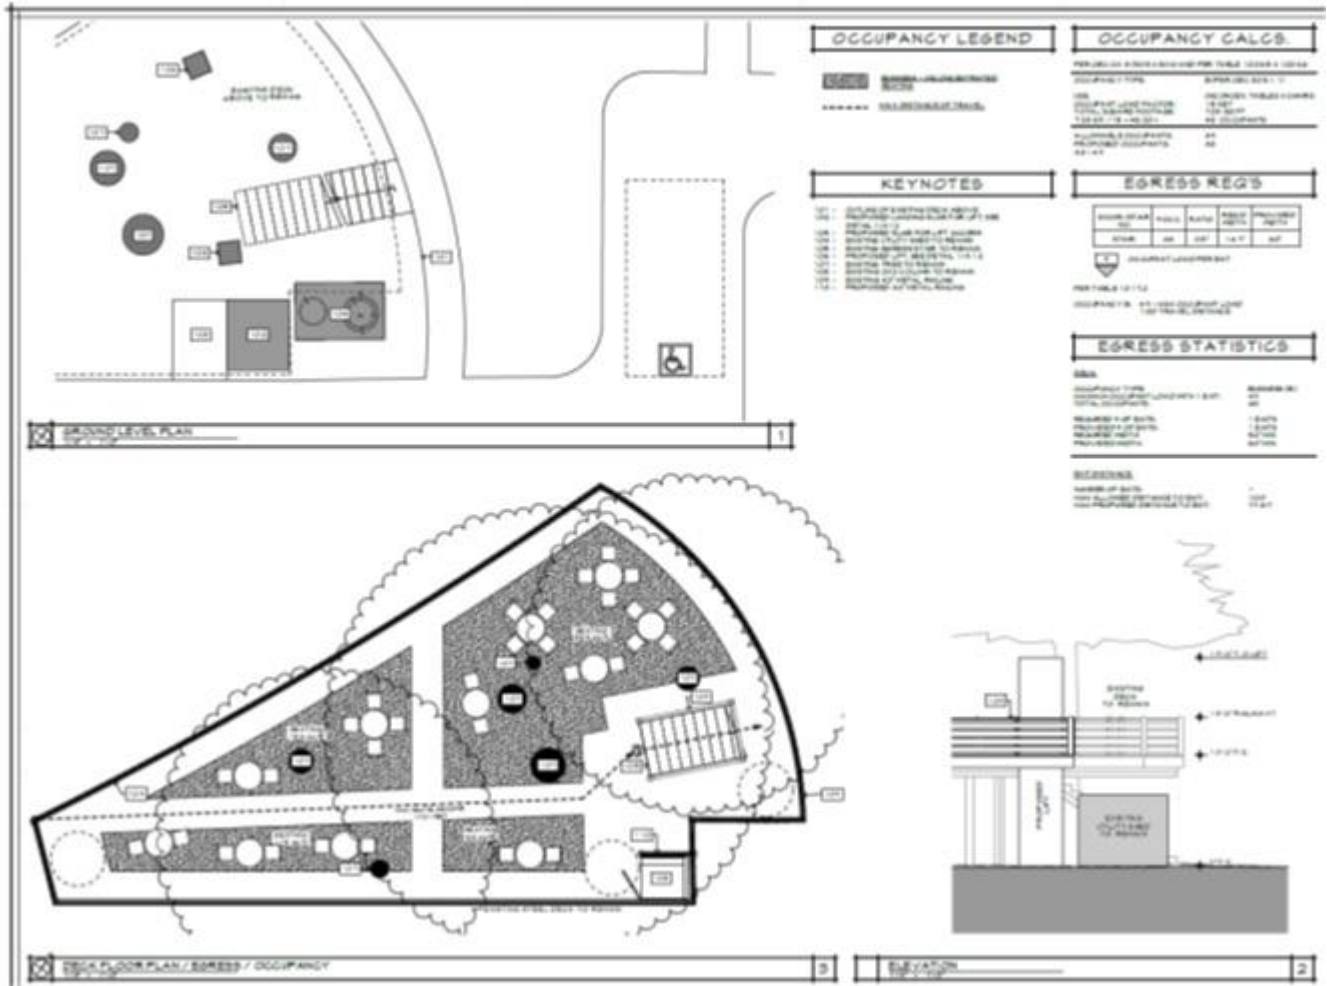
Improvements to the Existing ‘Tree House’ Deck Area
